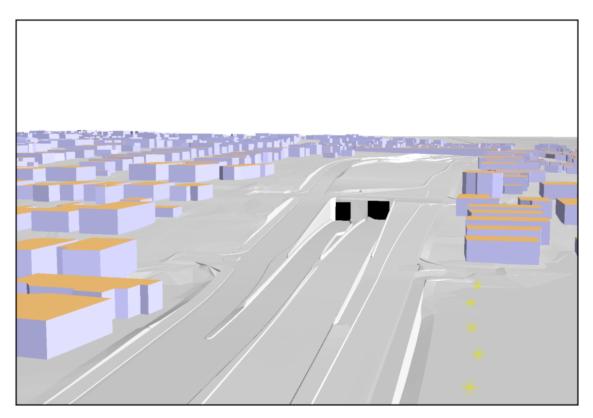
EIS Wattle Street interchange (oblique elevation, facing south)
